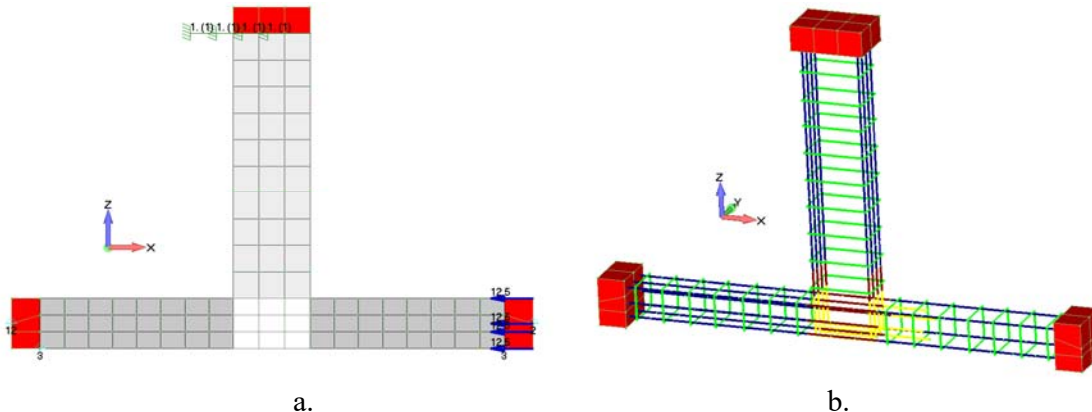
Bare RC joints JA2 and JB2. (a) Hexahedral and (b) embedded rebar finite element meshes.
